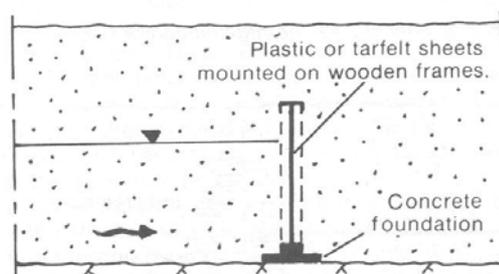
Plastic or tarred-felt sheets (Nilsson, 1988)
